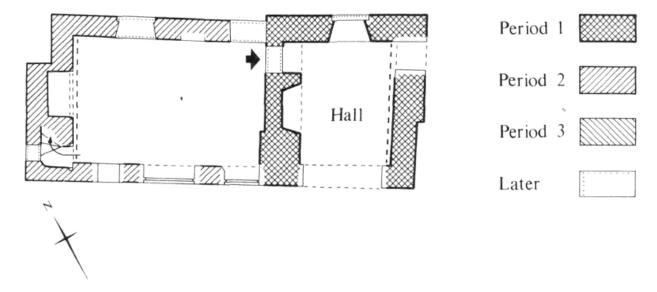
Plan of the 17th century elements of the Lower Cosmeston Farmhouse ground floor as recorded by the RCAHMW
